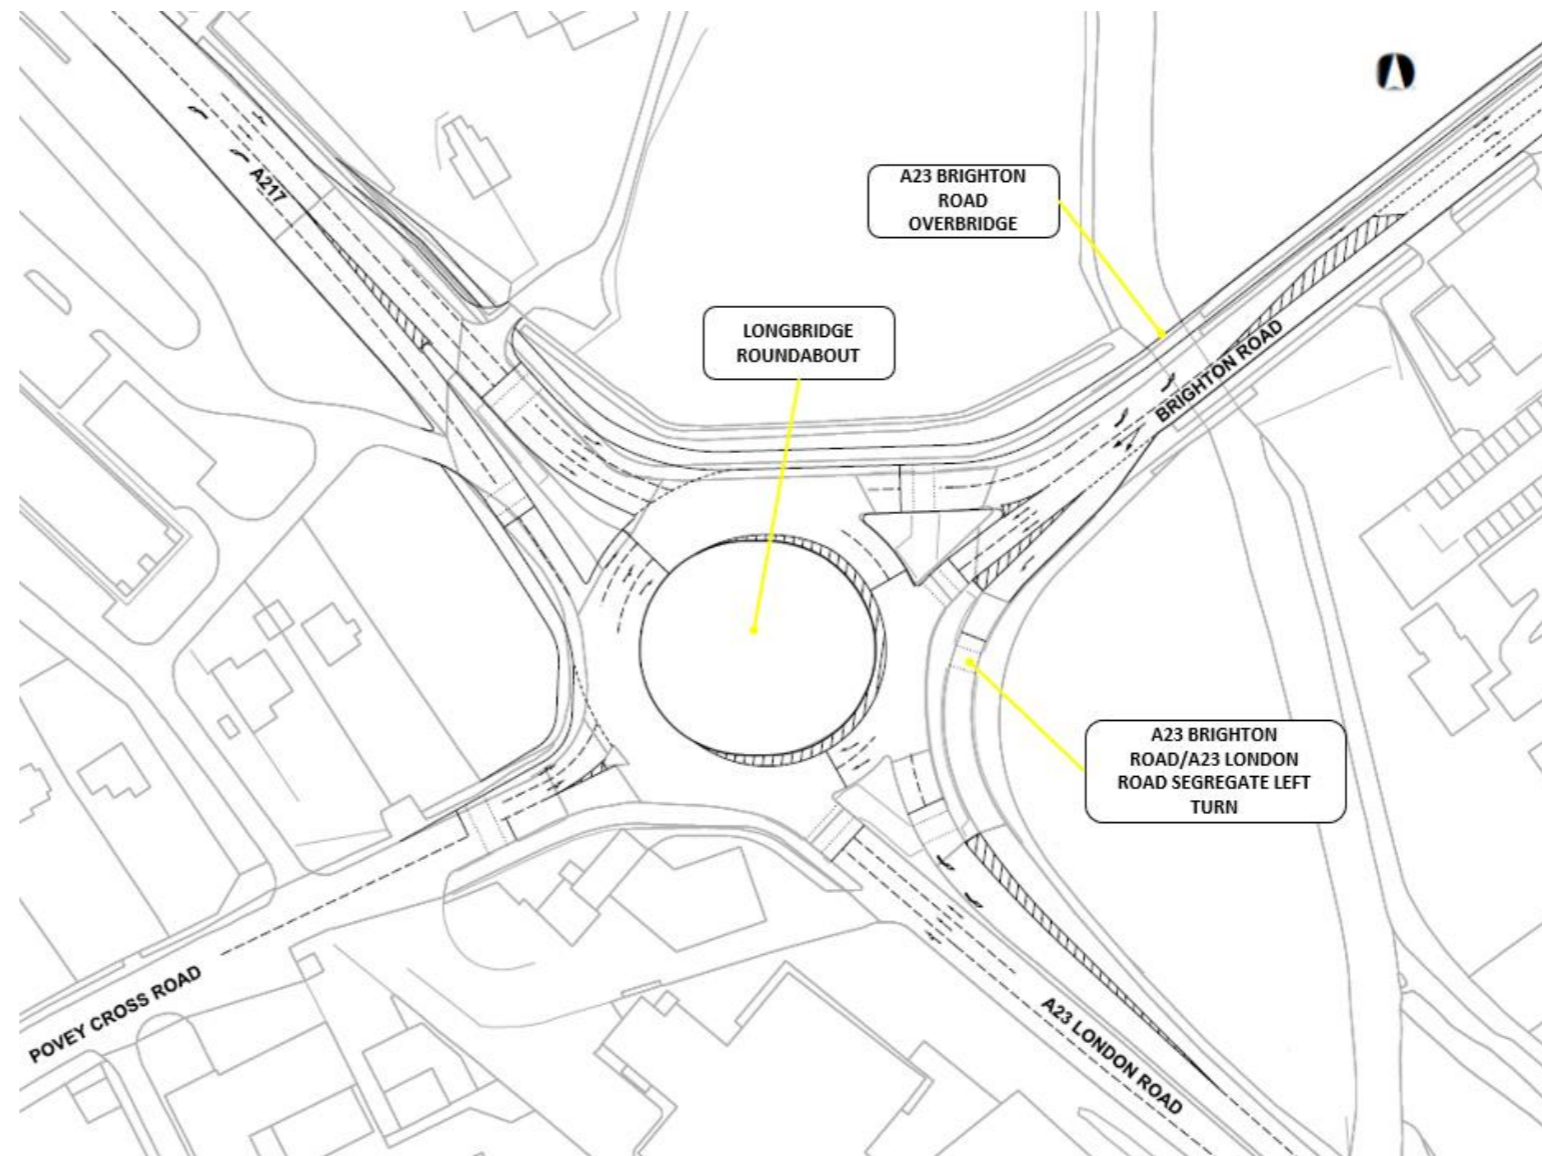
Longbridge Junction Signal-Controlled Roundabout Concept Layout
